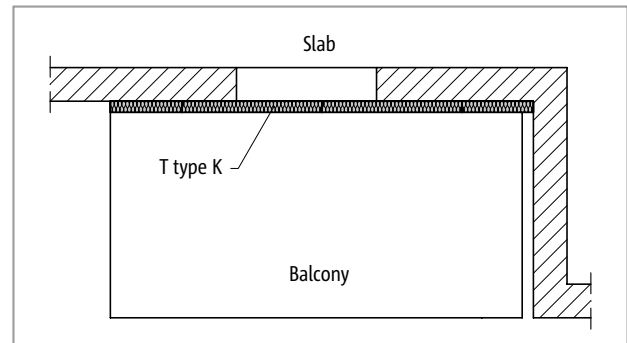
Schöck Isokorb® T type K: Balcony with facade offset
